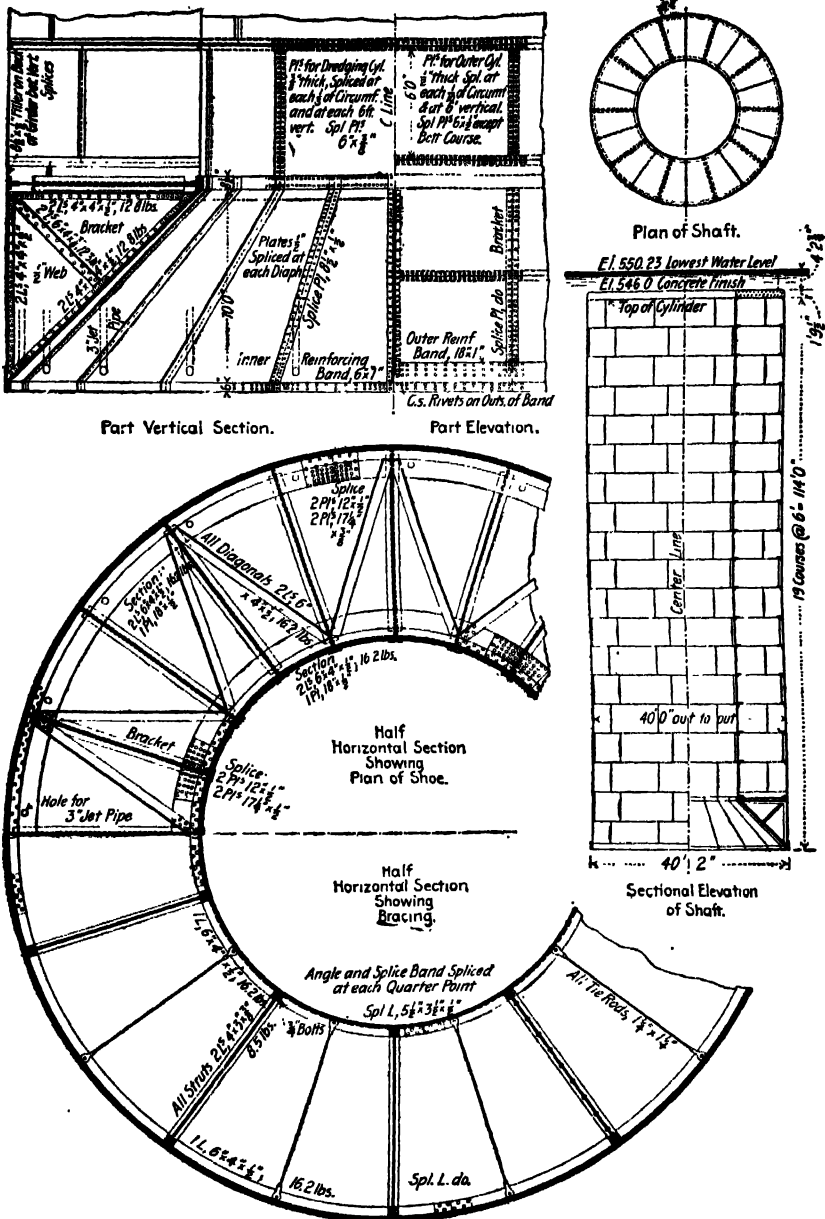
Open-dredging Caisson for the East Omaha Bridge over the Missouri River.
